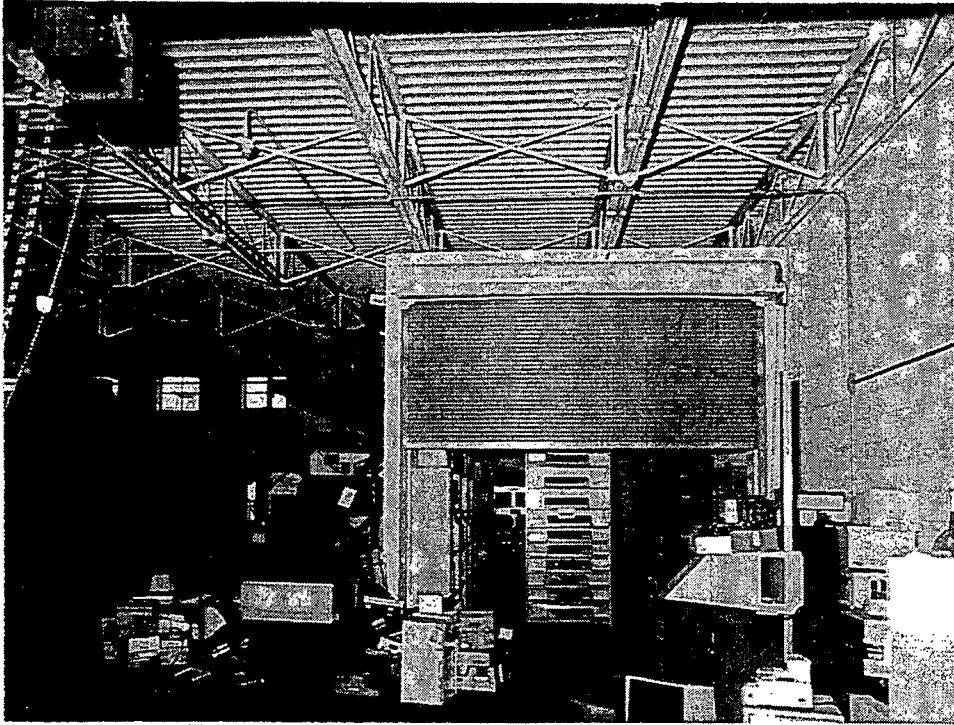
Building 32A - Structural Steel, Overhead Door, Masonry Block
